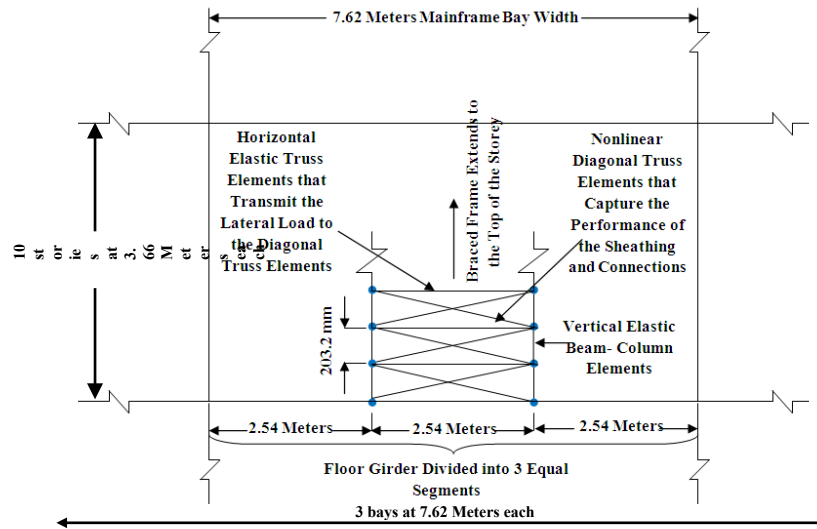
Equivalent Single Bay Braced Frame Representation of Stud Backing Wall
